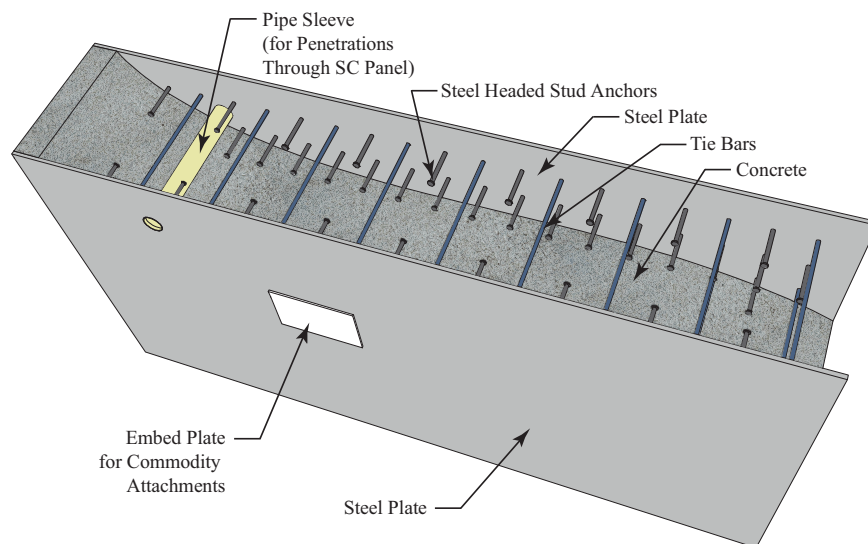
Typical SC Wall Section (from Johnson et al. (2014))
